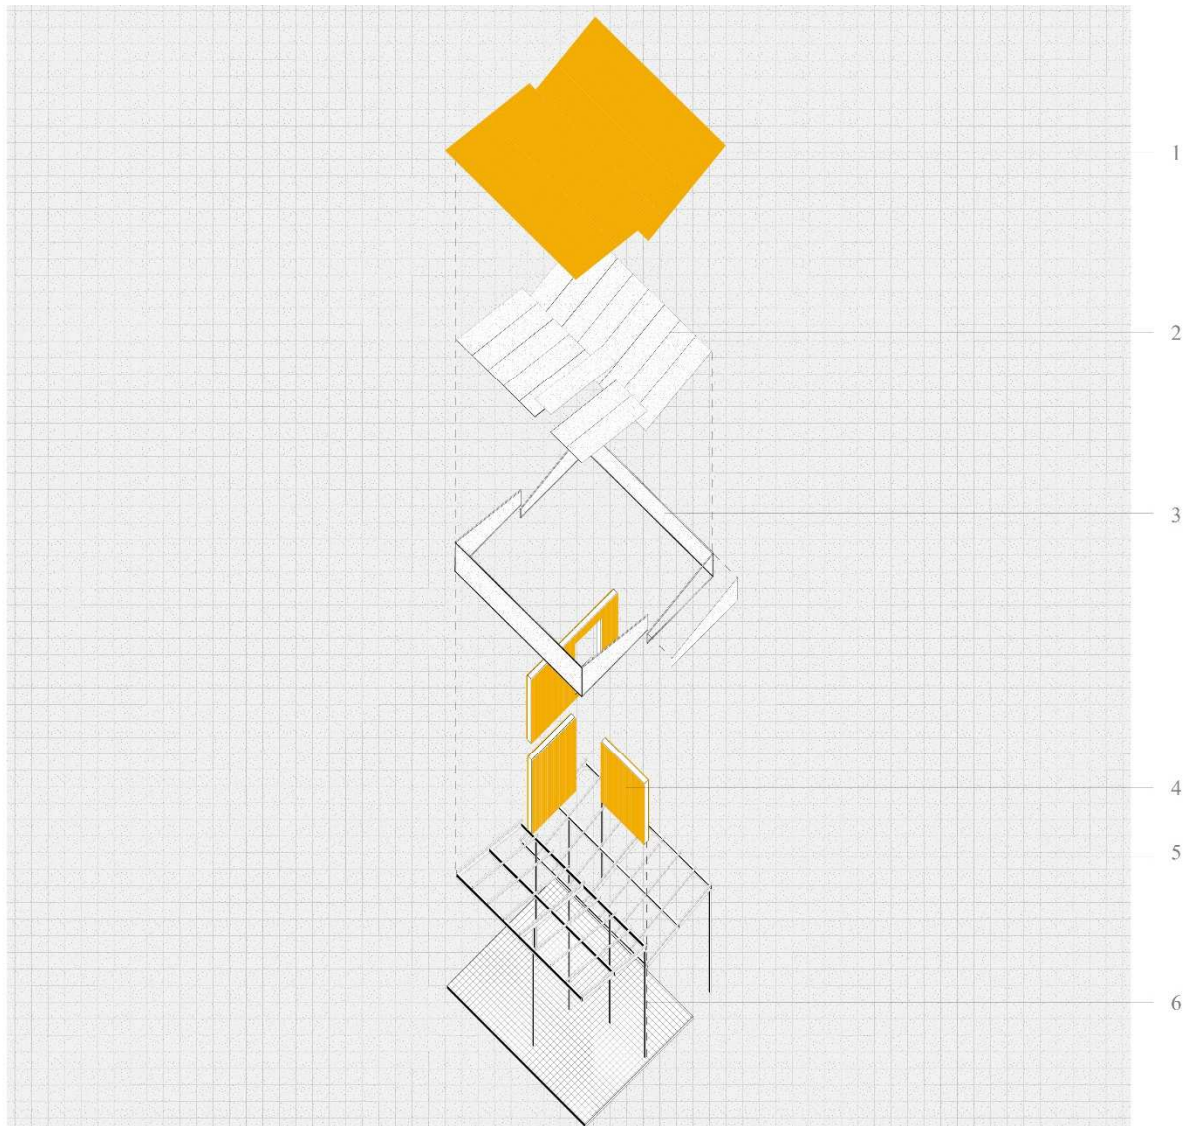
Public room prototype*, 1) Roof perforated panels 2) Polycarbonate ceiling 3) Translucent cornice 4) Room partitions 5) Steel structure 6) Existing floor, Marco Giribaldo
